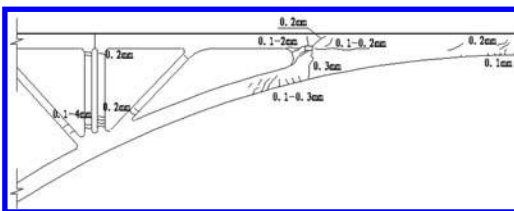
The truss joints crack greatly between precast upper and lower chords, web members and vertical members.
